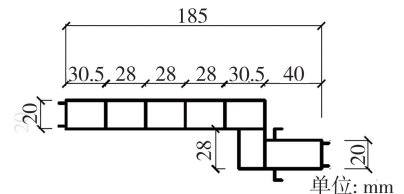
Arrangement of PVC hollow core pipe and slit plate
